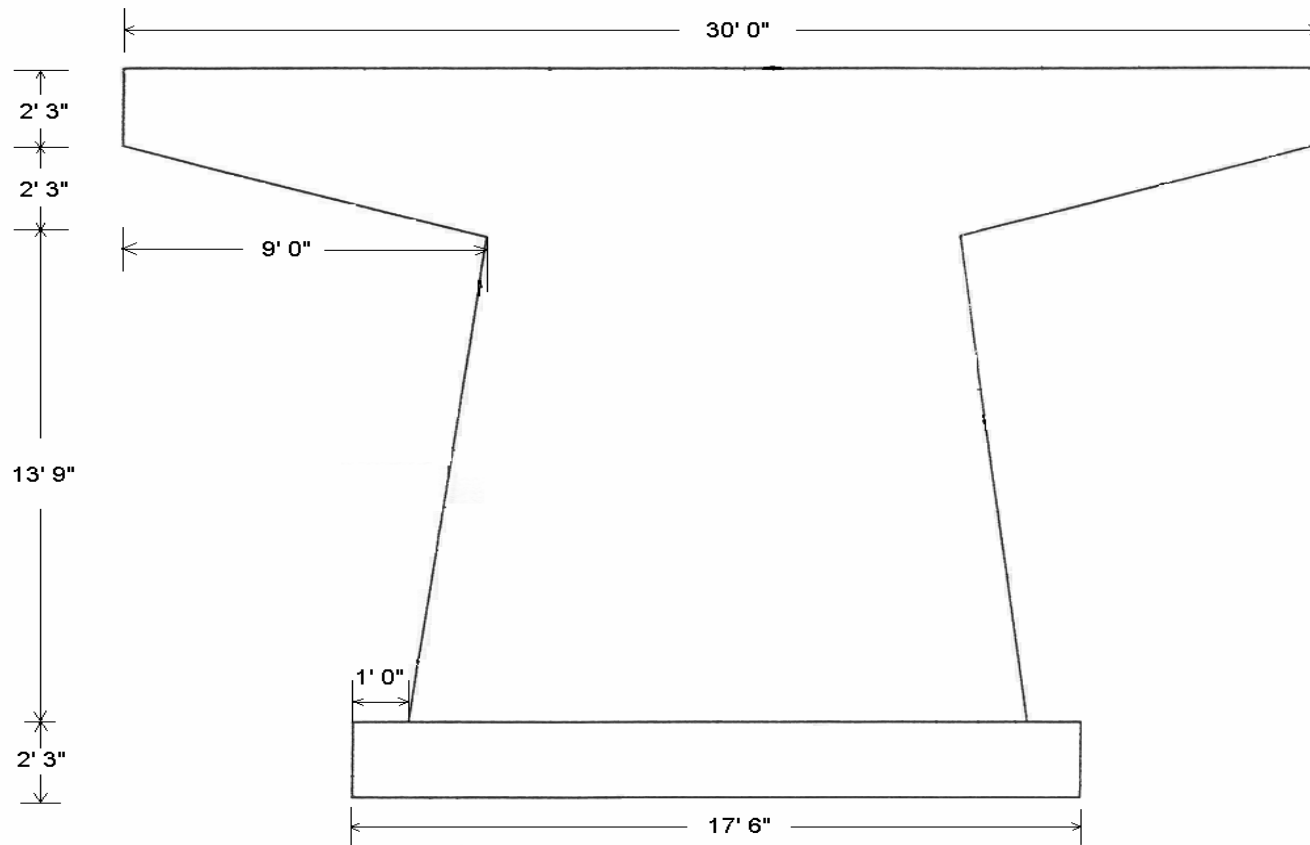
Existing Bridge Geometry – Interior Bent
